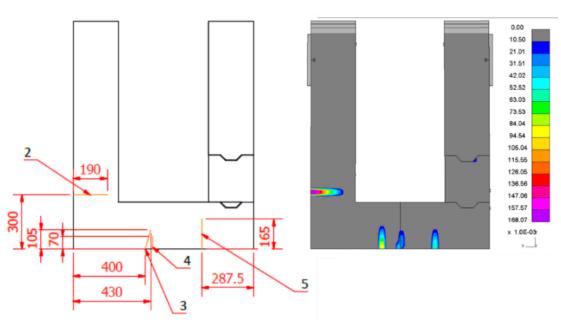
Specimen 1 crack pattern front view; (left) physical test (right) numerical model. Precast connection on right-hand specimen leg.
